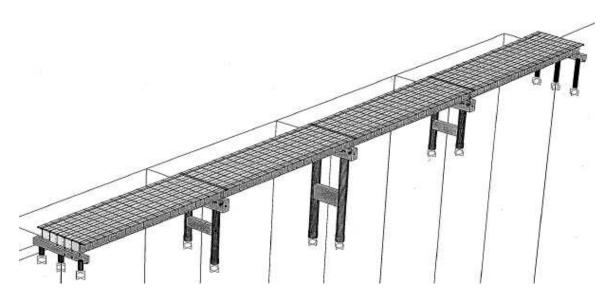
3-D SAP Model of Scarham Creek Bridge
